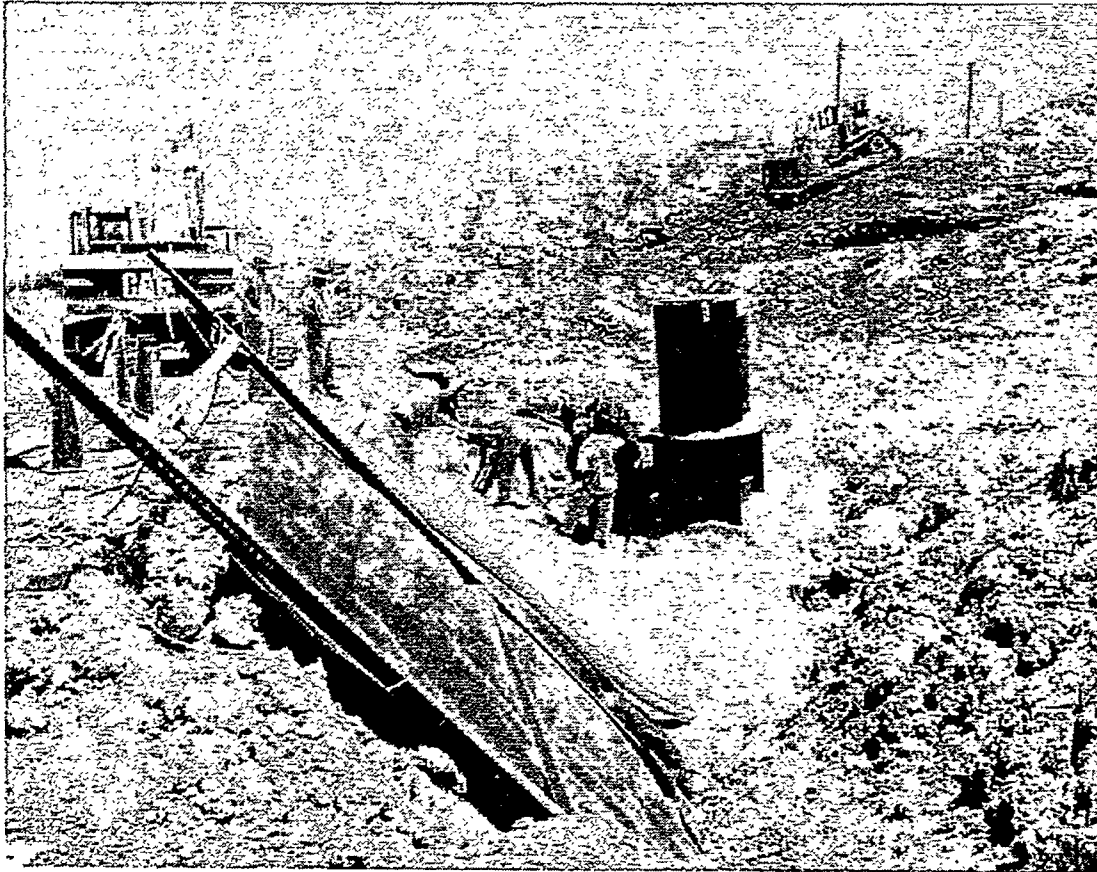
HDPE collection wall and sump. Low Cohesion (sloughing) soil conditions resulted in slanted installation of the HDPE in some areas of the wall.
